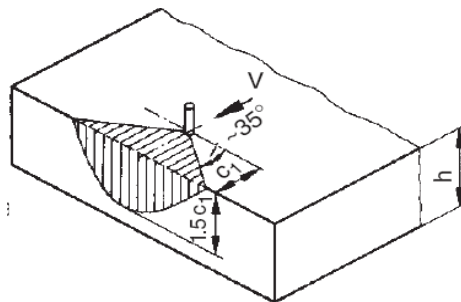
Anchor loaded in shear towards an edge (after Fuchs, Eligehausen(1995)). Idealised shape of typical concrete failure body[2]
